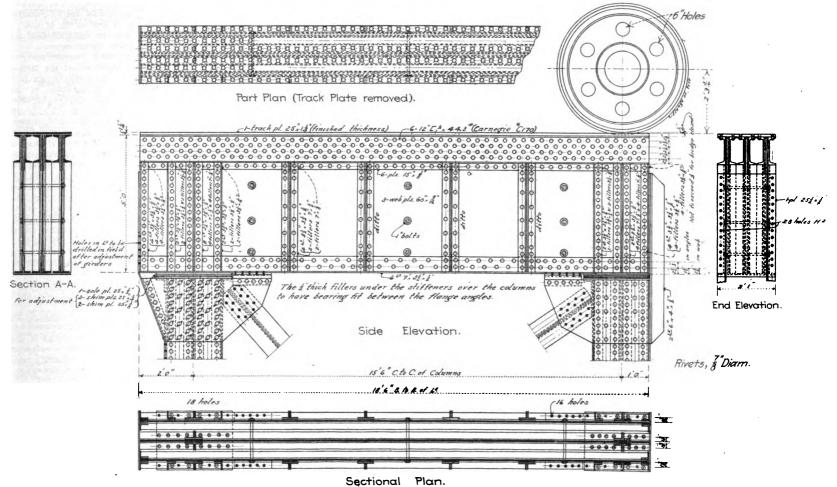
TRACK GIRDER OF BASCULE BRIDGE.
